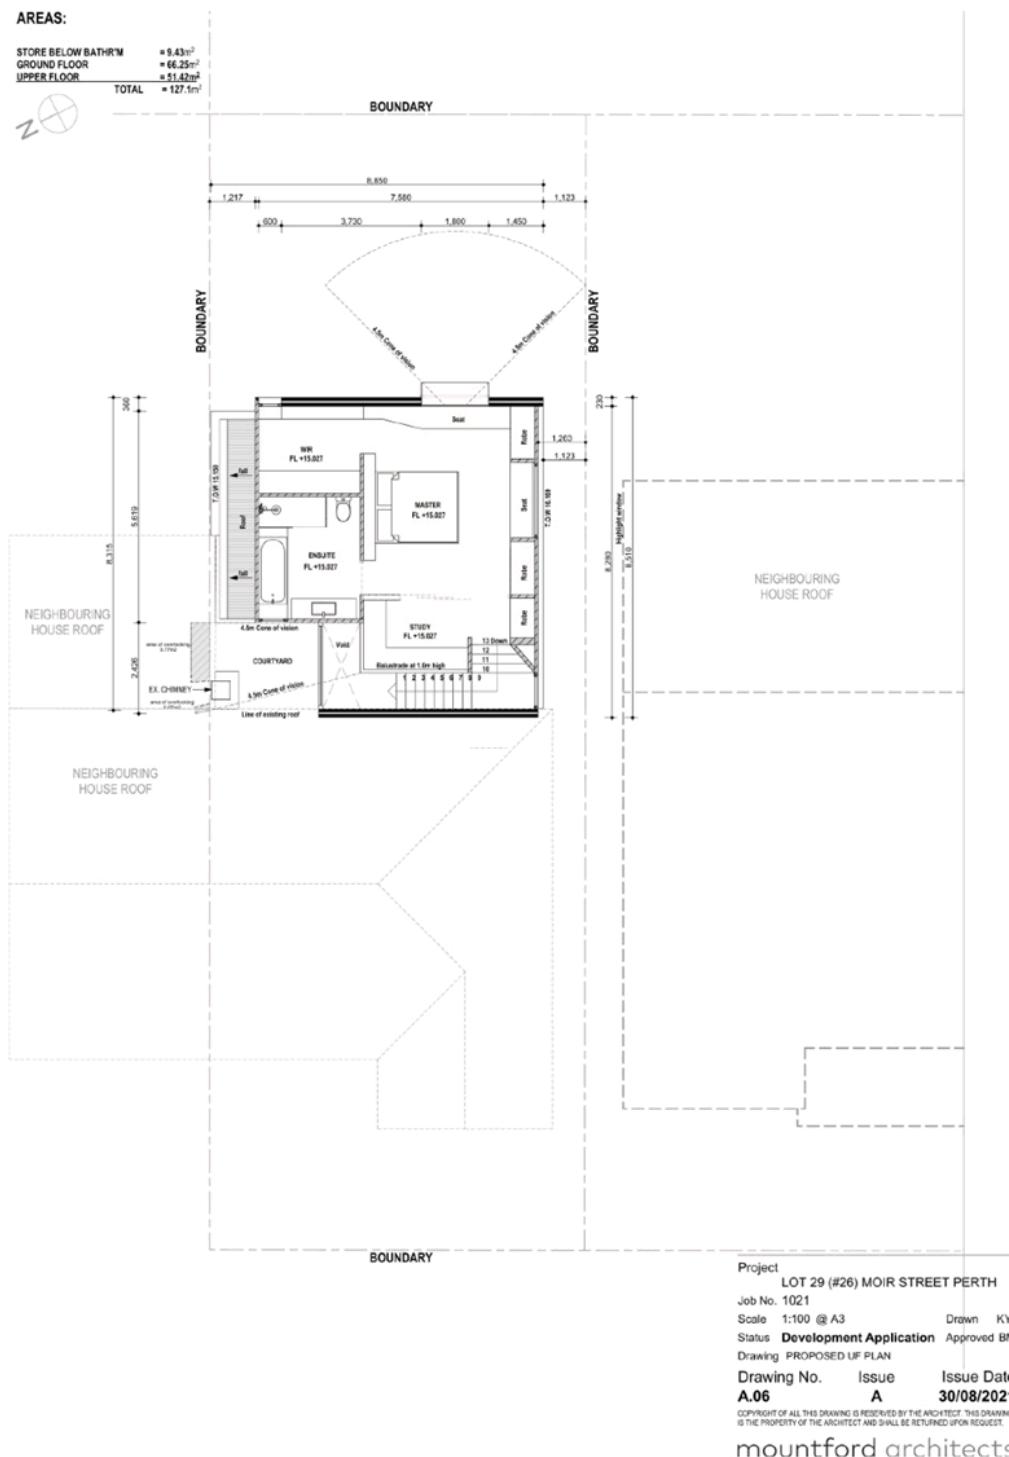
PROPOSED UPPER FLOOR PLAN
